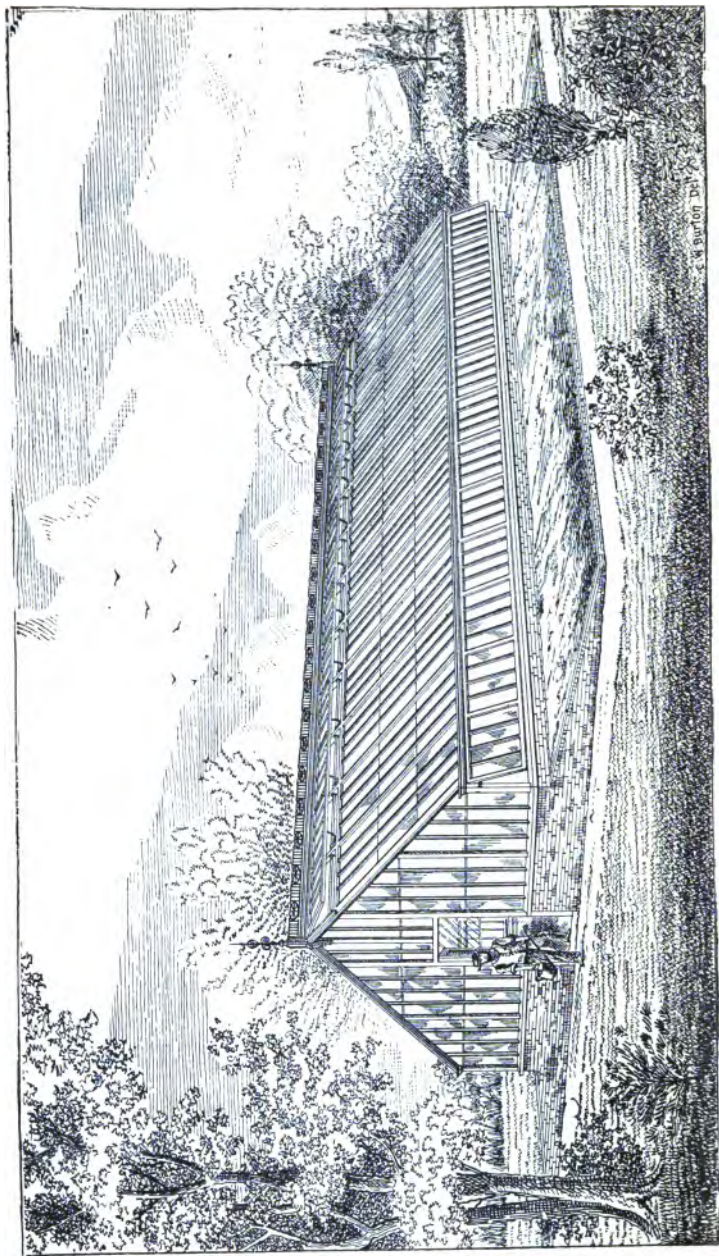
SPAN-ROOFED HOUSE, WITH FRONT VENTILATING SASHES.
